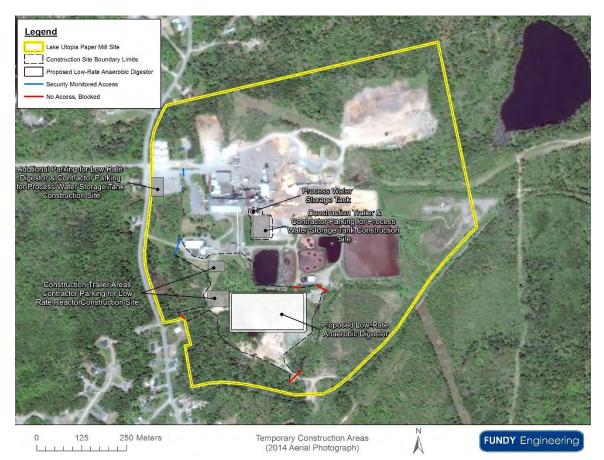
Aerial photograph of the Lake Utopia Paper Mill in Utopia, New Brunswick showing the locations proposed for contractor project trailers, project parking areas, material laydown areas, and construction entrances for construction of effluent treatment upgrade project.
